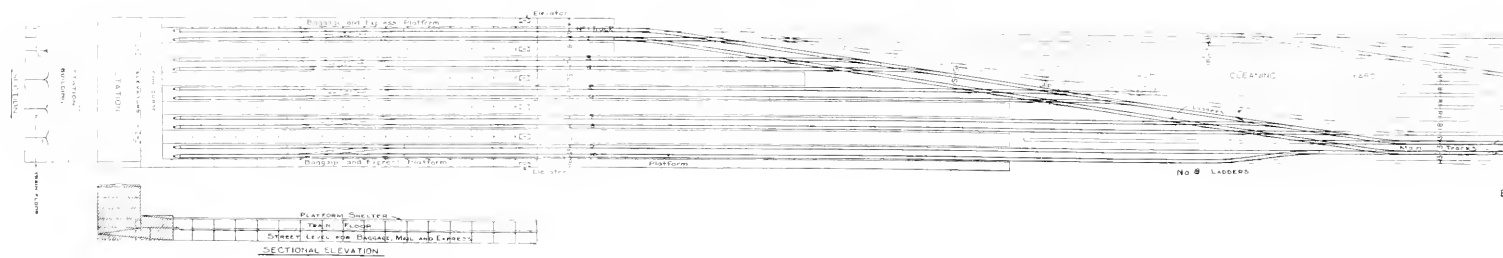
TYPICAL TRACK LAYOUT AT DEAD-END PASSENGER TERMINAL STATION.
